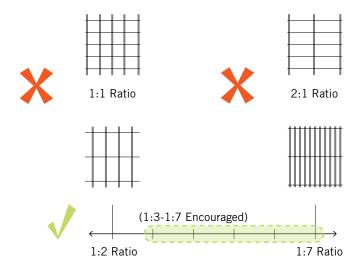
H1 Façade Articulation: Vertical Façade Proportions
